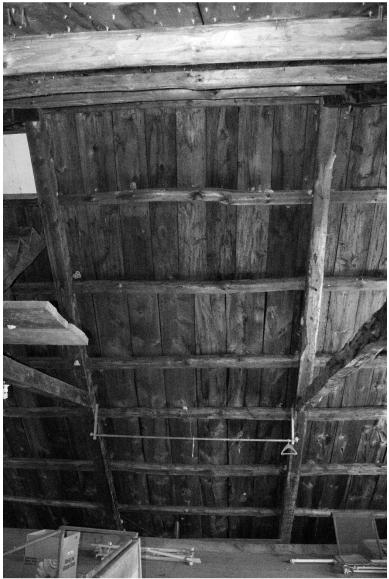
Roof framing shows purlins and rafters Reference (file name): PIC_0628
